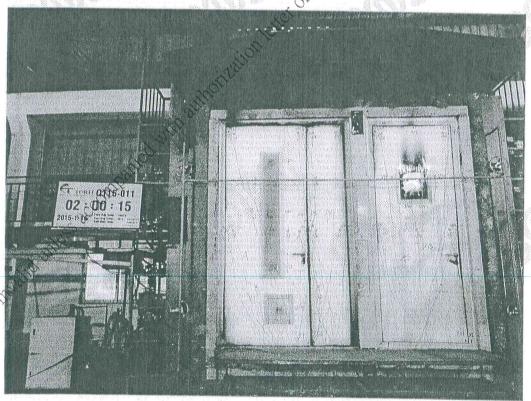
Unexposed surface of the specimen at 120 minute of test.
